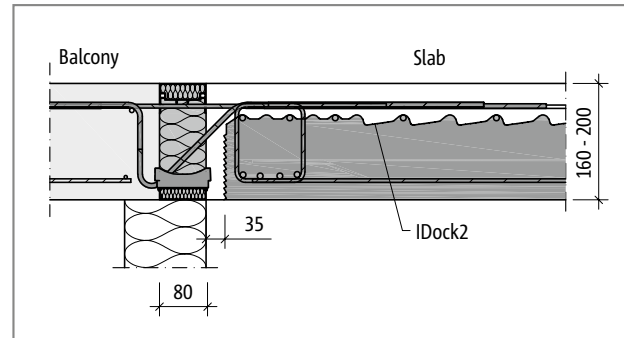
Schöck Isokorb® T type K-E: Connection of balconies with slab thicknesses of 160 mm to 200 mm with IDock2
